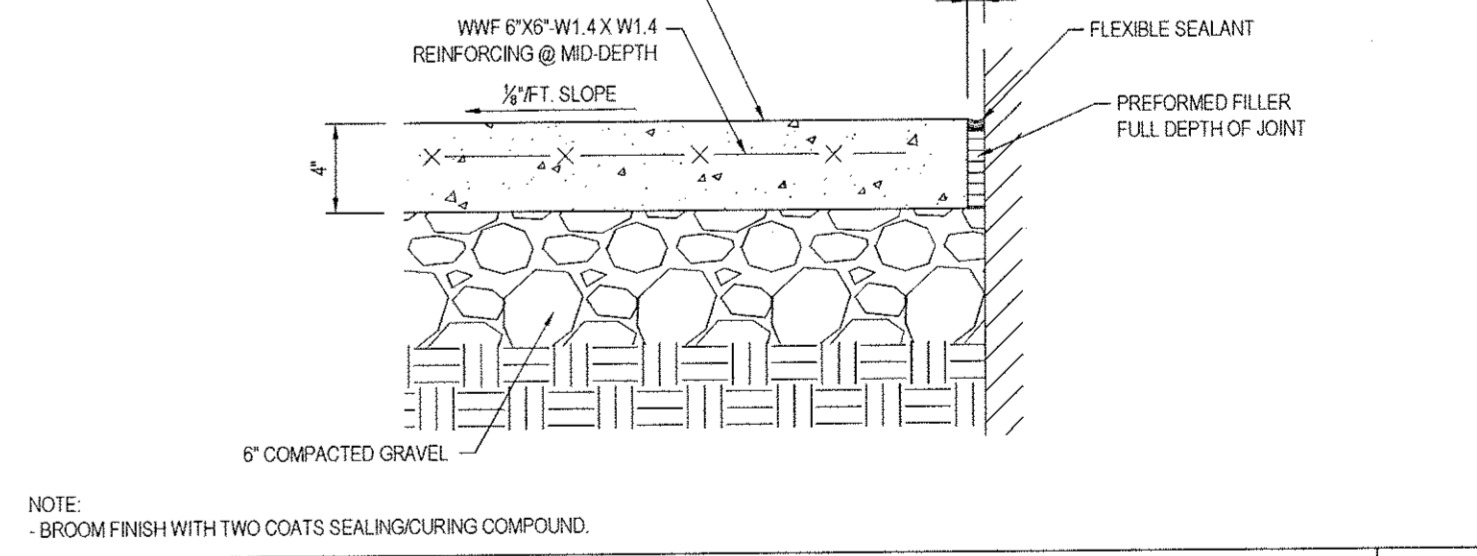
DETAIL @ SIDEWALK EXPANSION JOINT N.T.S.
